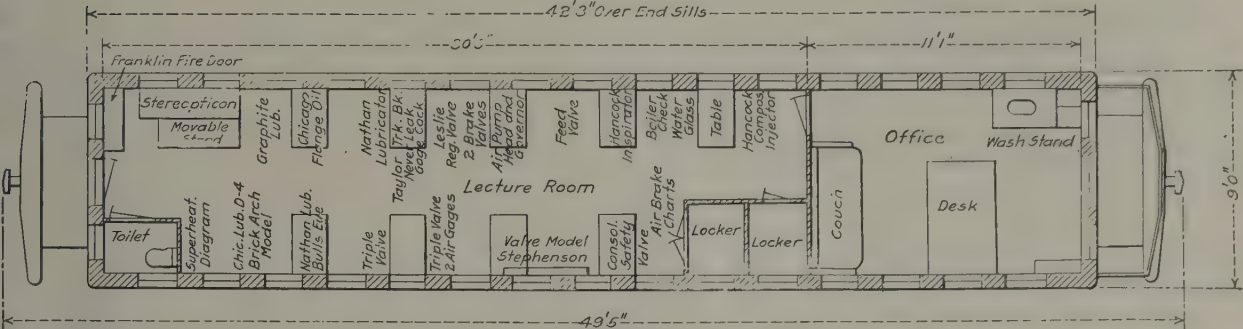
Floor Plan of Delaware, Lackawanna & Western Fuel Instruction Car. Interior View Is Shown in Fig. 426.
